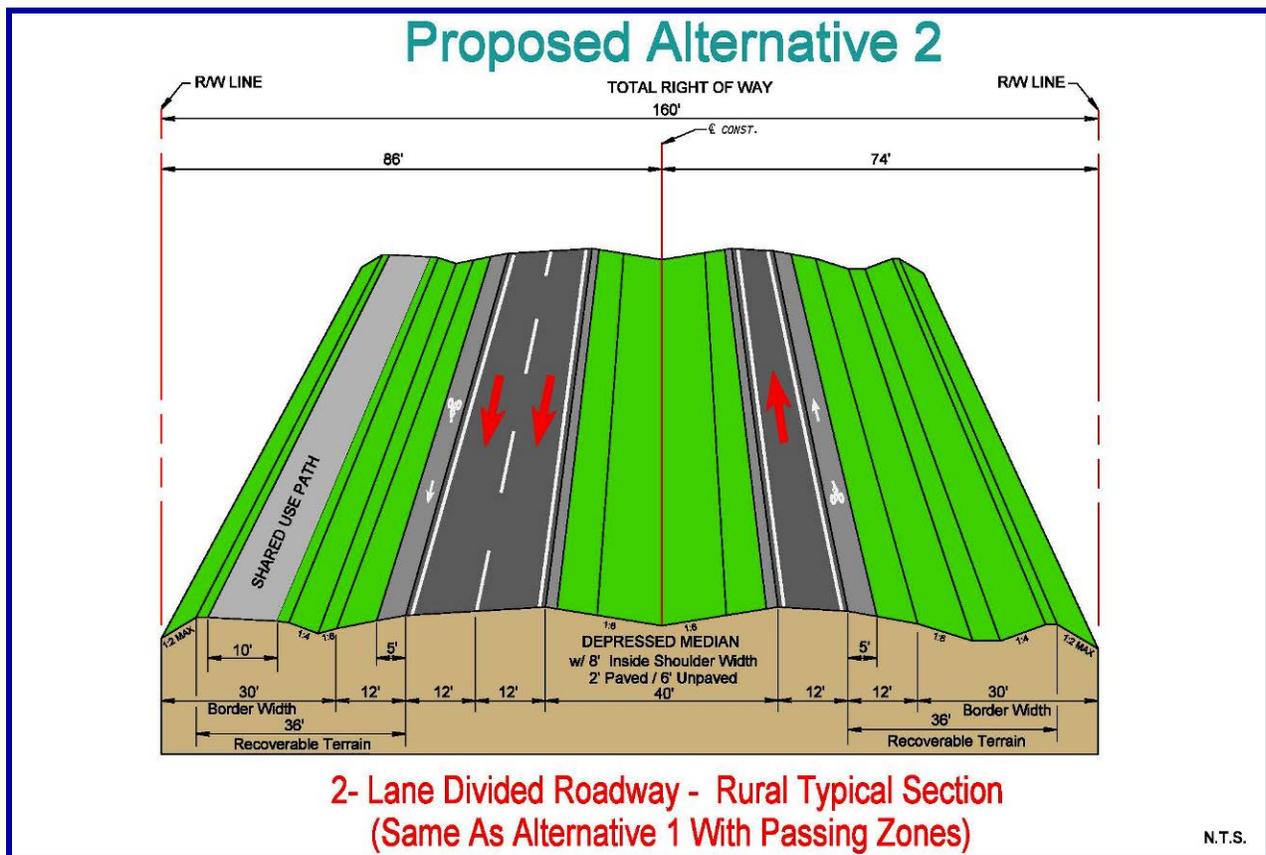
Alternative 2 Proposed Typical Roadway Section (Rural)
